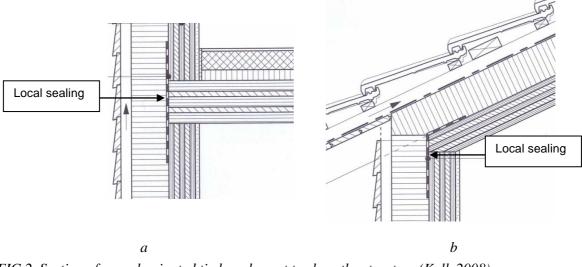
Section of cross laminated timber element to show the structure (Kolb 2008)
